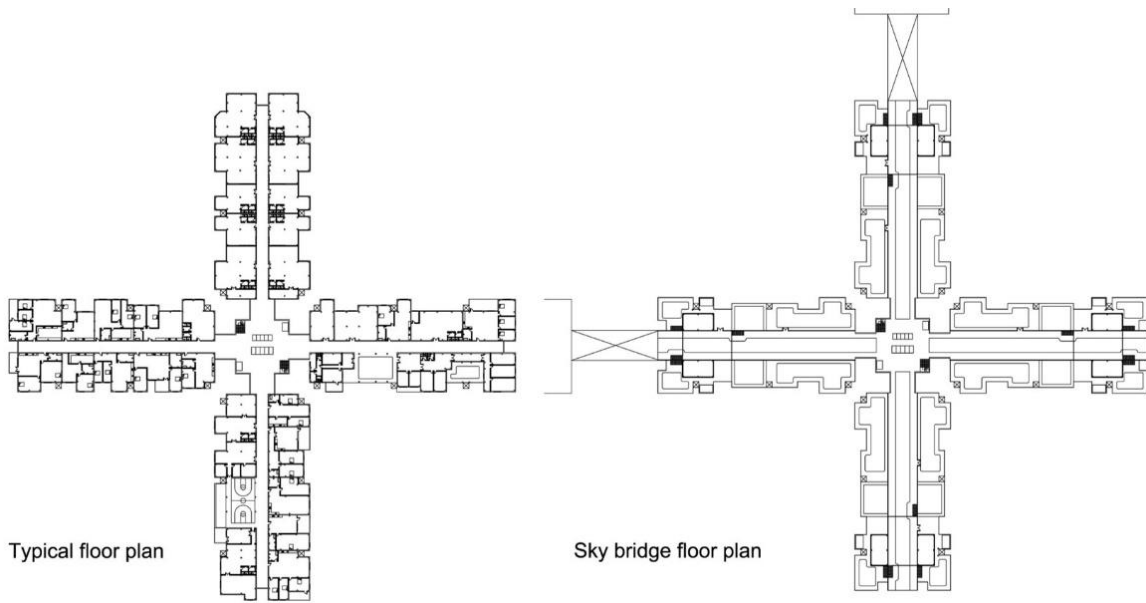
Typical floor plans in the Dynamic Vertical Urbanism complex
